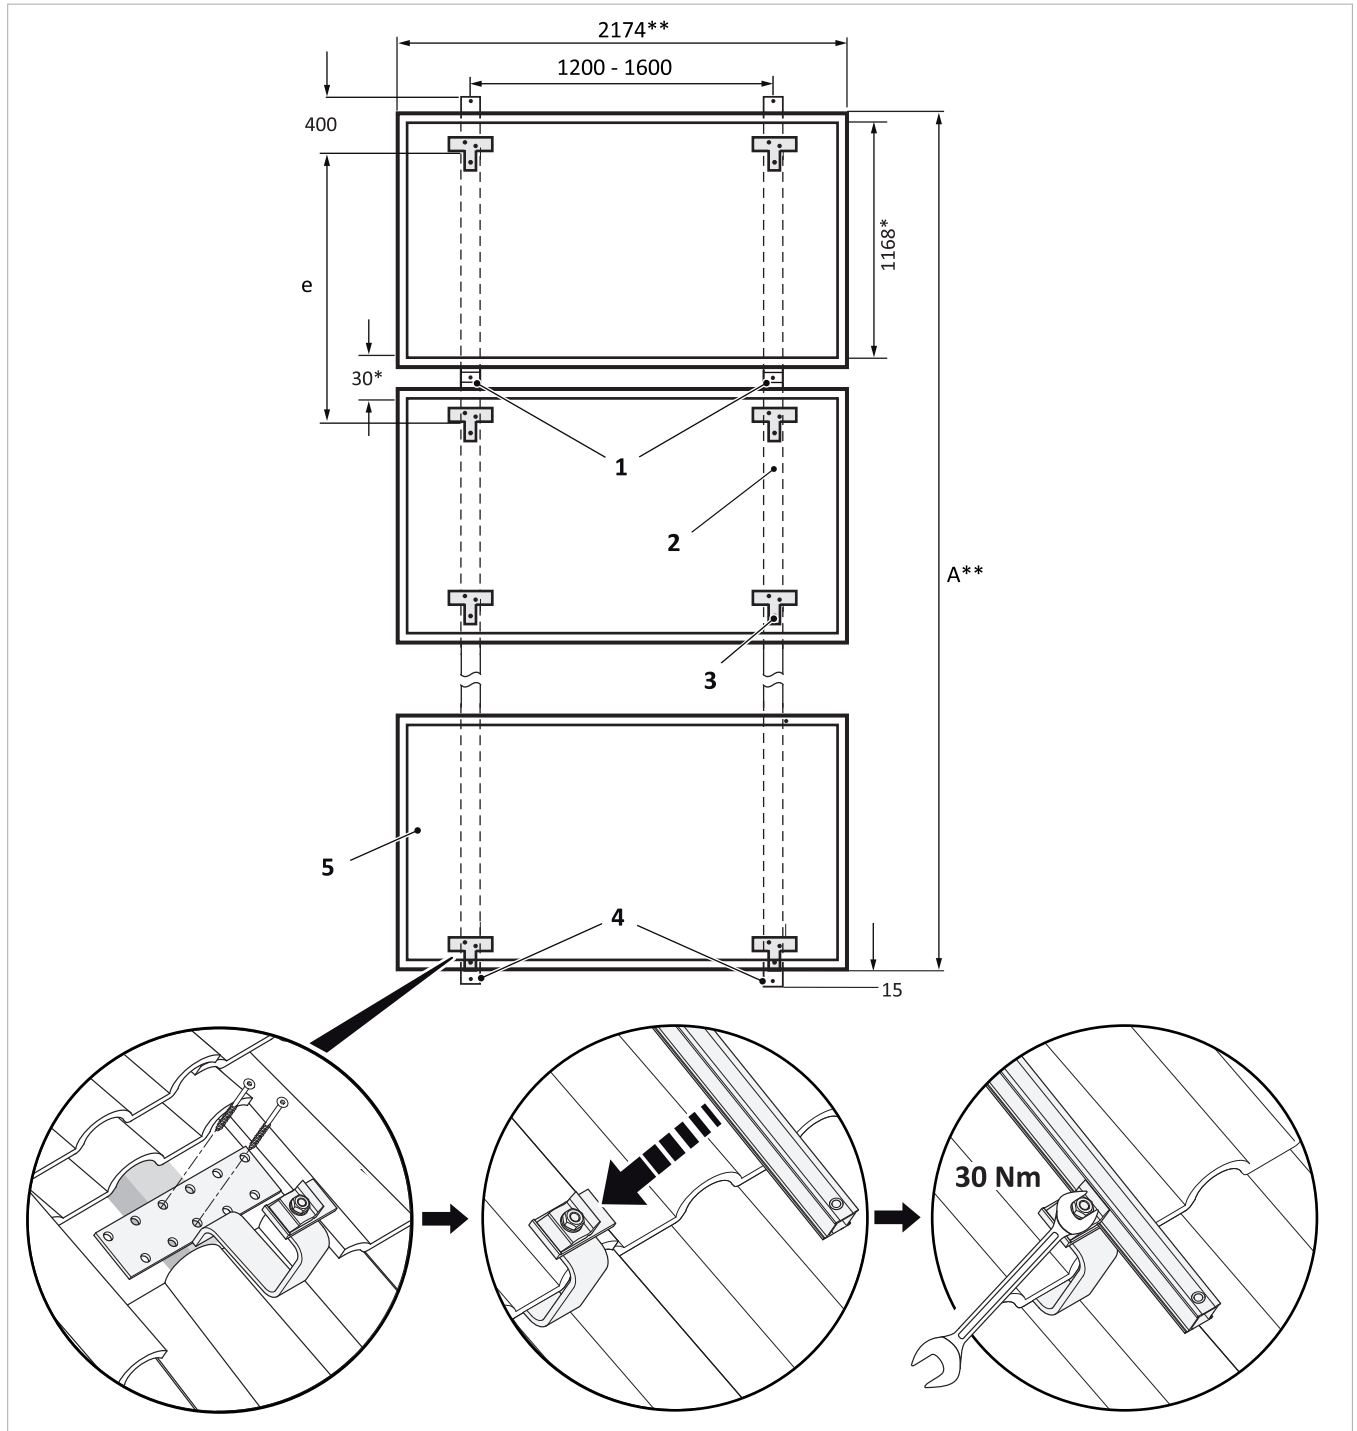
Vertical installation of the roof brackets and mounting rails.
